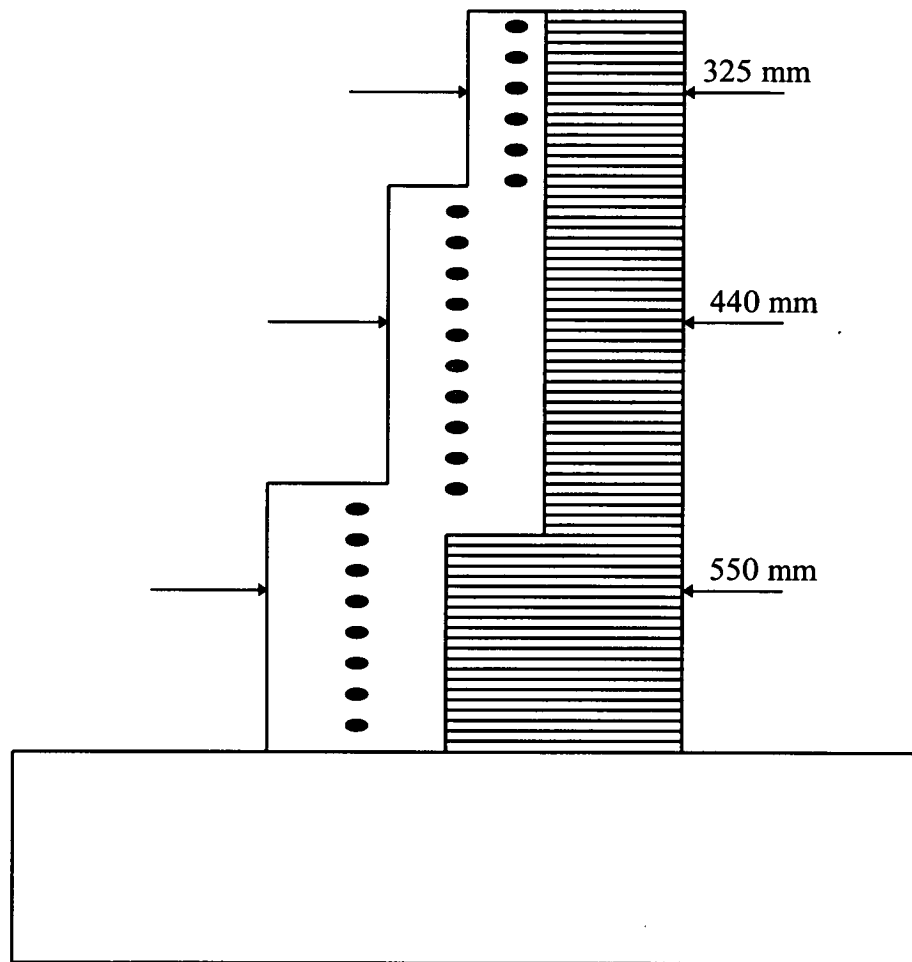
(b) : Cross Section Through Pocket-Wall Showing Bed-Joint Reinforcement
